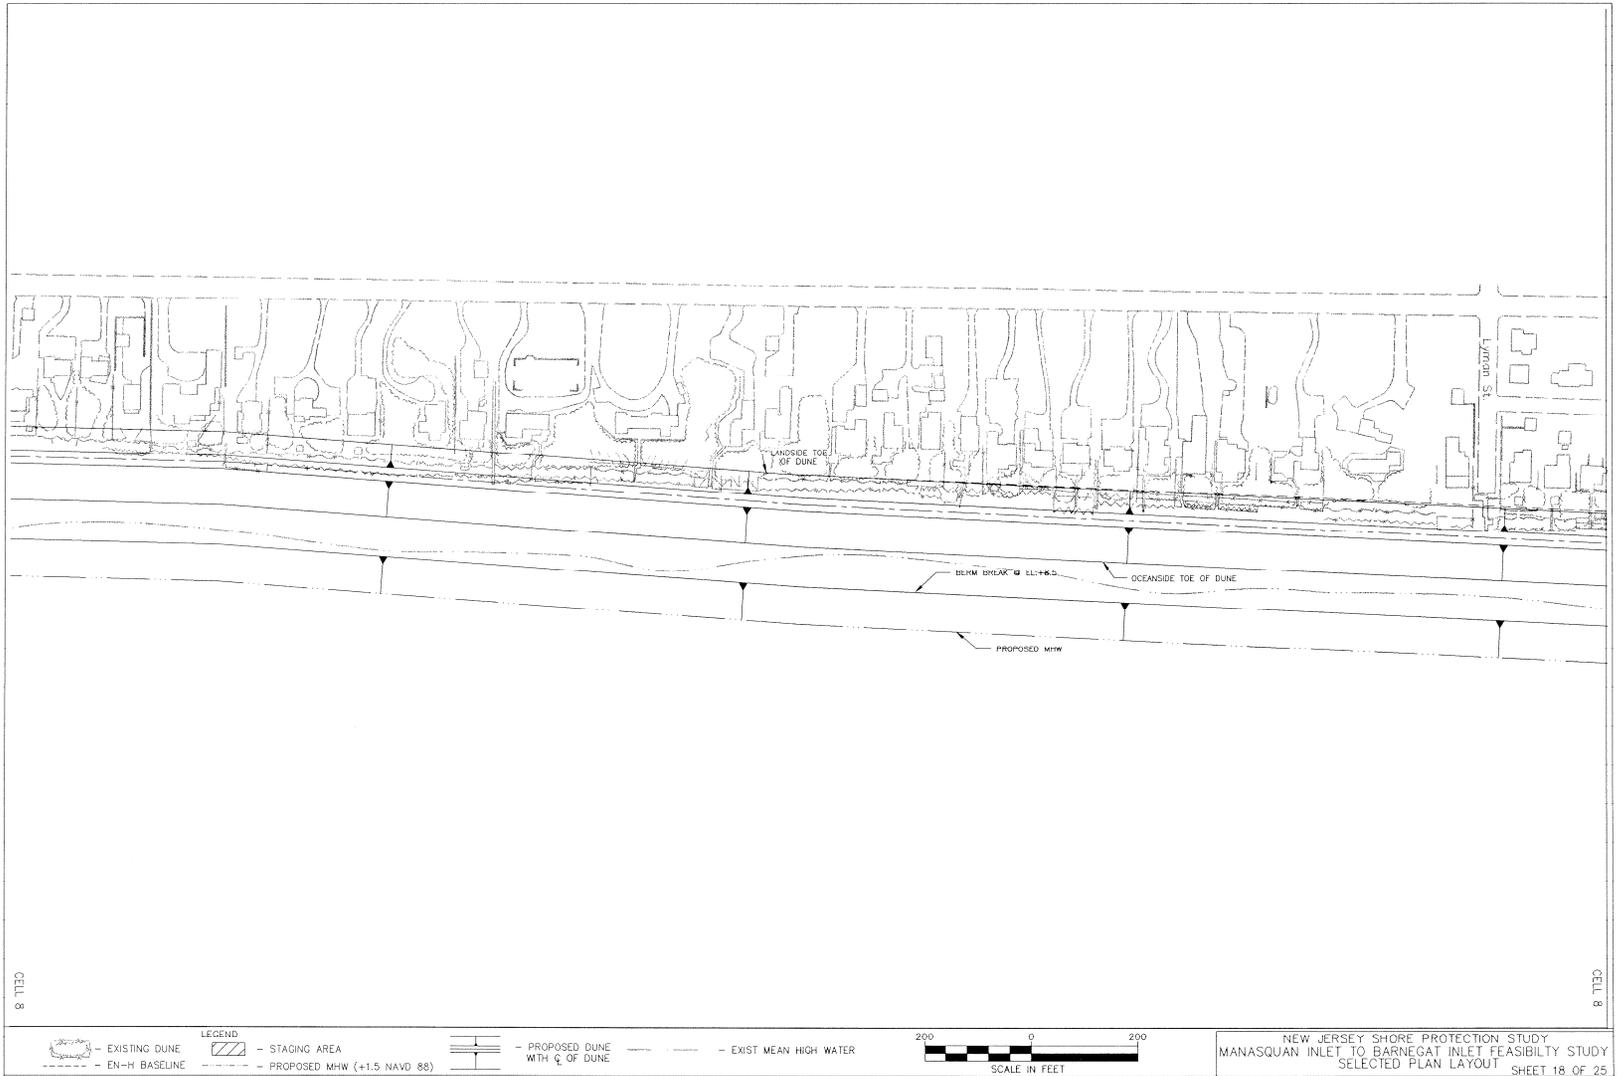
Selected Plan Layout – Mantoloking Borough, South of Lyman Street
